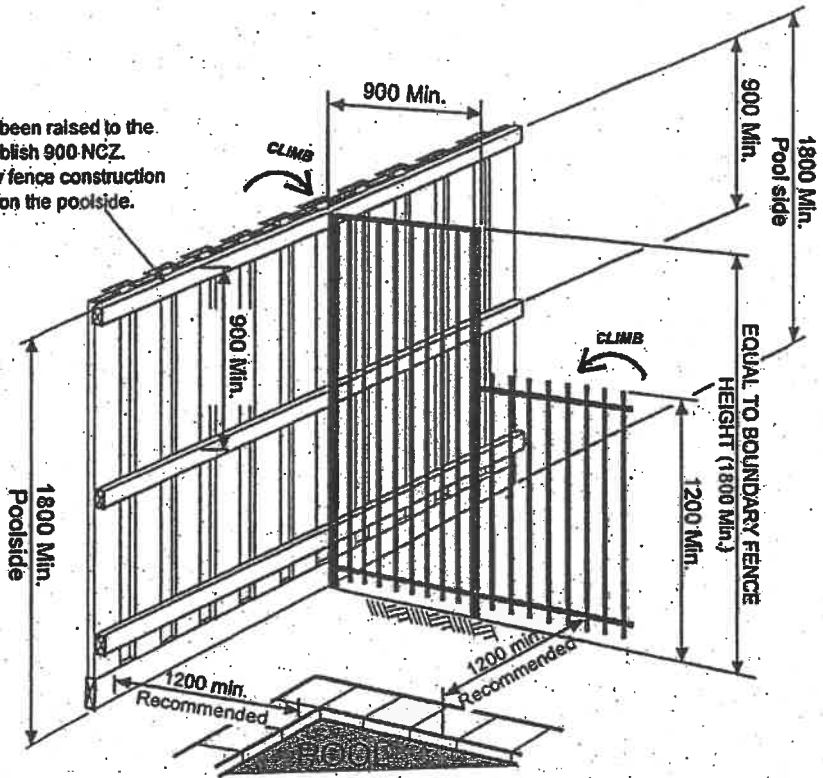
ALTERNATIVE BOUNDARY FENCE INTERSECTING A TYPICAL POOL BARRIER
